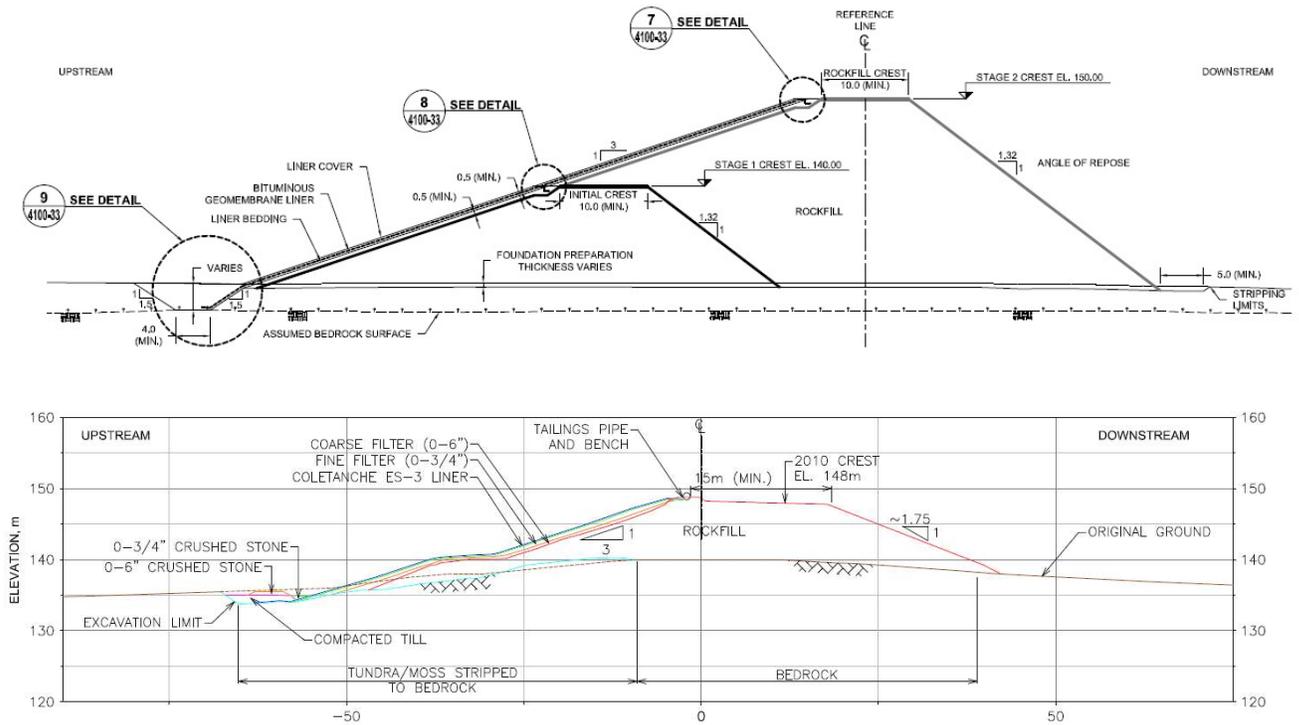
Typical Cross-section of Stormwater Dike (top). As-built section of Phase 2 (bottom)
